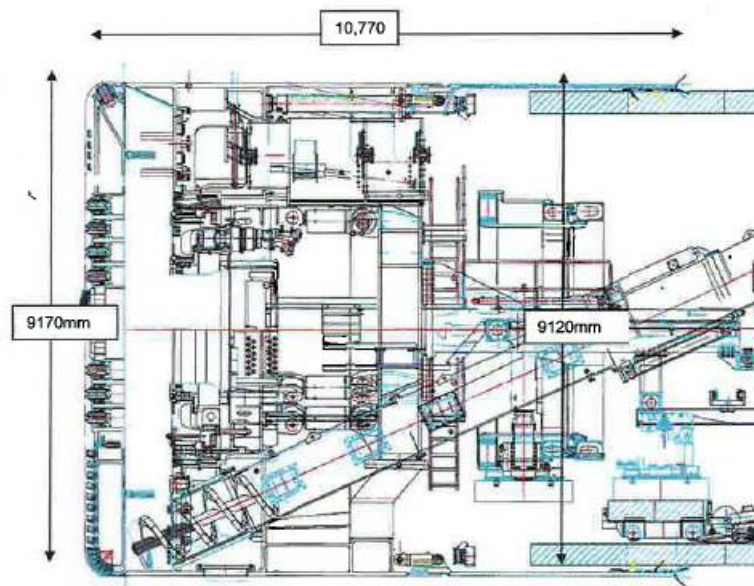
Boring Tunnel Machine (ELODIE)
